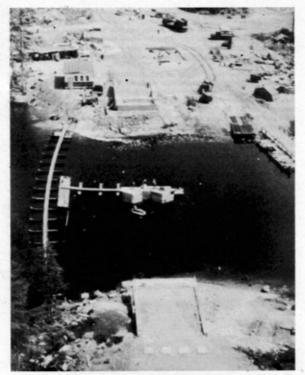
Petawawa River Bridge. On the near bank are four of the concrete grillages ready to accept the steel bridge beams. The pier has reached the level at which the tendons are stressed.
